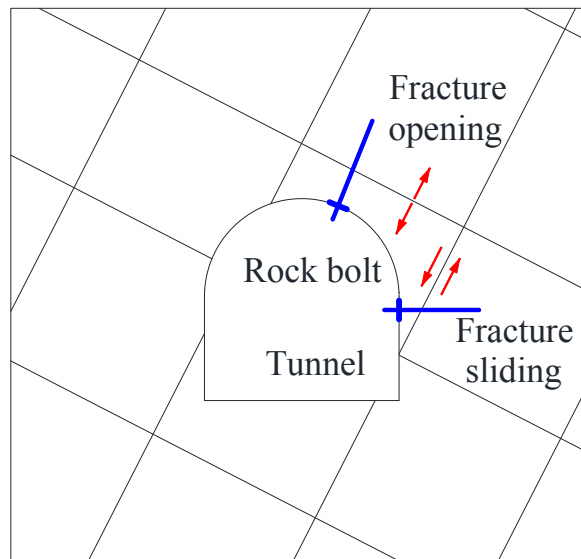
Failure mode of rebar bolts under large deformation conditions
